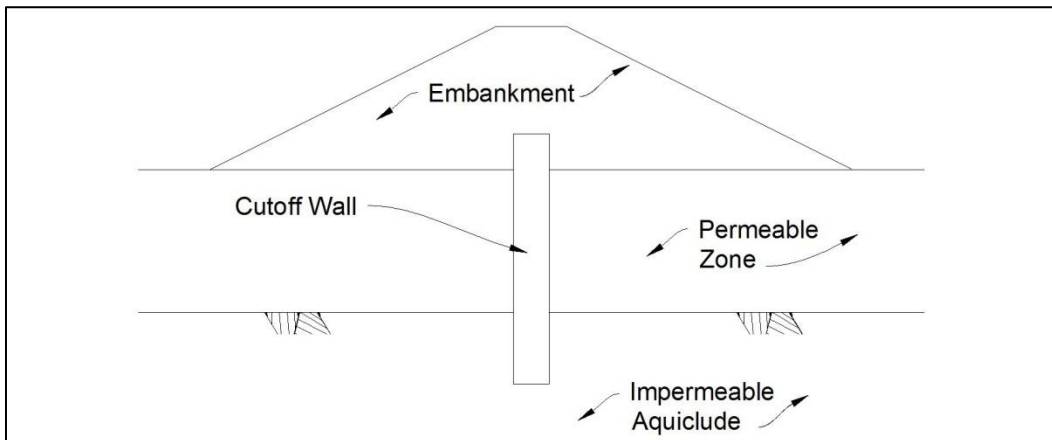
Fully penetrating cutoff wall (blocks seepage).
